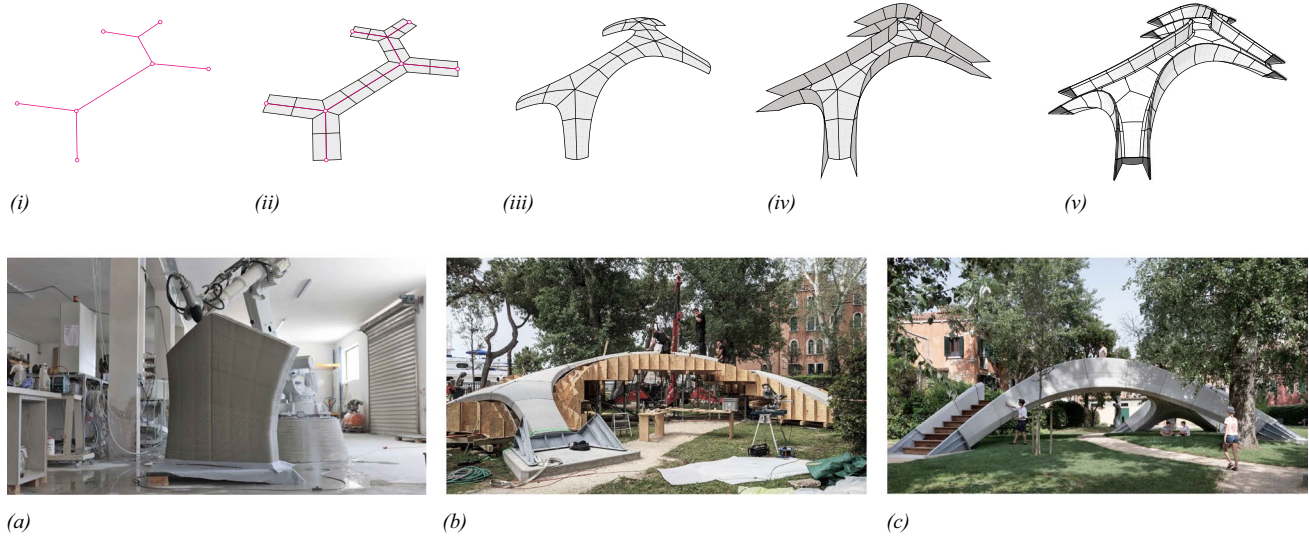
Design to production tool chain and physical demonstrator. (i-v) procedure to design a compression-only bridge structure and its stereotomy (a) robotic 3D concrete printing of blocks, (b) on site assembly, and (c) finished bridge
